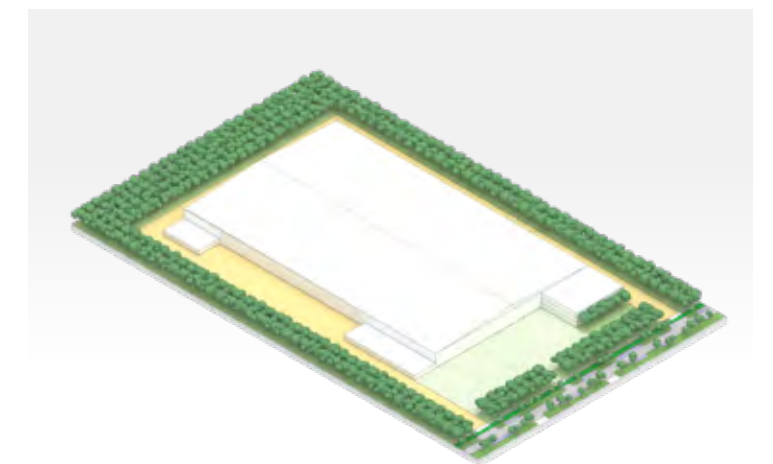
Employment: Industrial – Large floorplate: Pervious paving and perimeter planting
